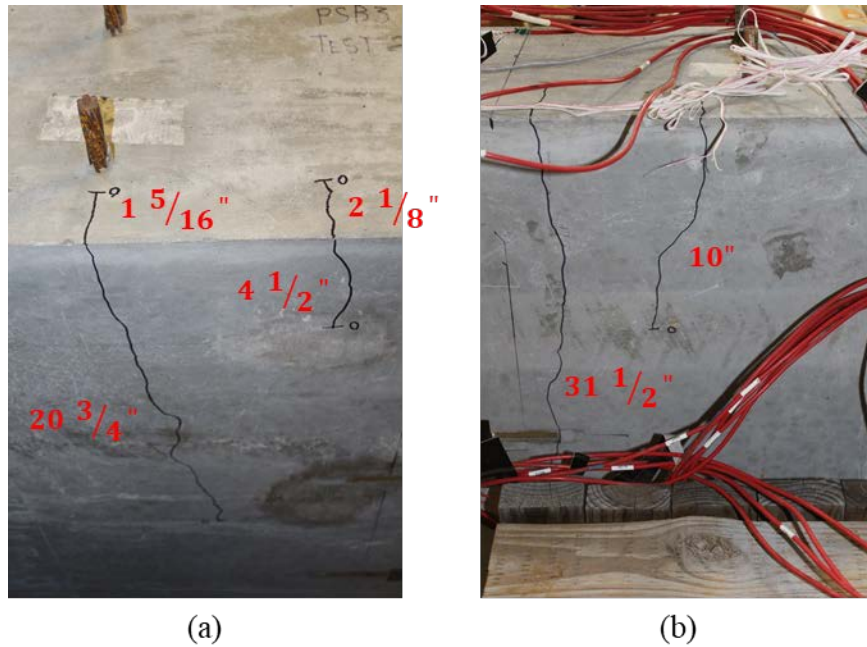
Cracking and crack lengths after accidental loading of 12F1-2 before fatigue testing on the (a) bottom of the west side and (b) bottom of the east side
